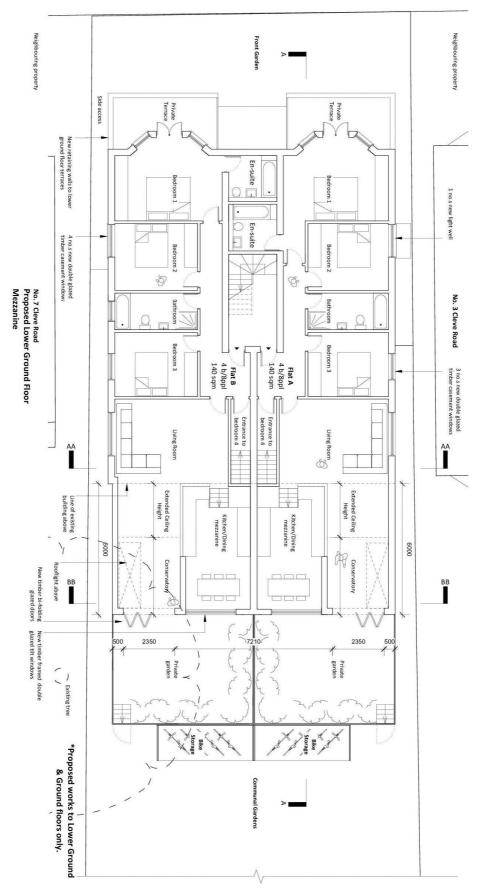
The proposed new works extend the lower ground floor to the rear of the building. The new basement area is below the two central 'kitchen / dining mezzanines' and so is away from the flank walls.
